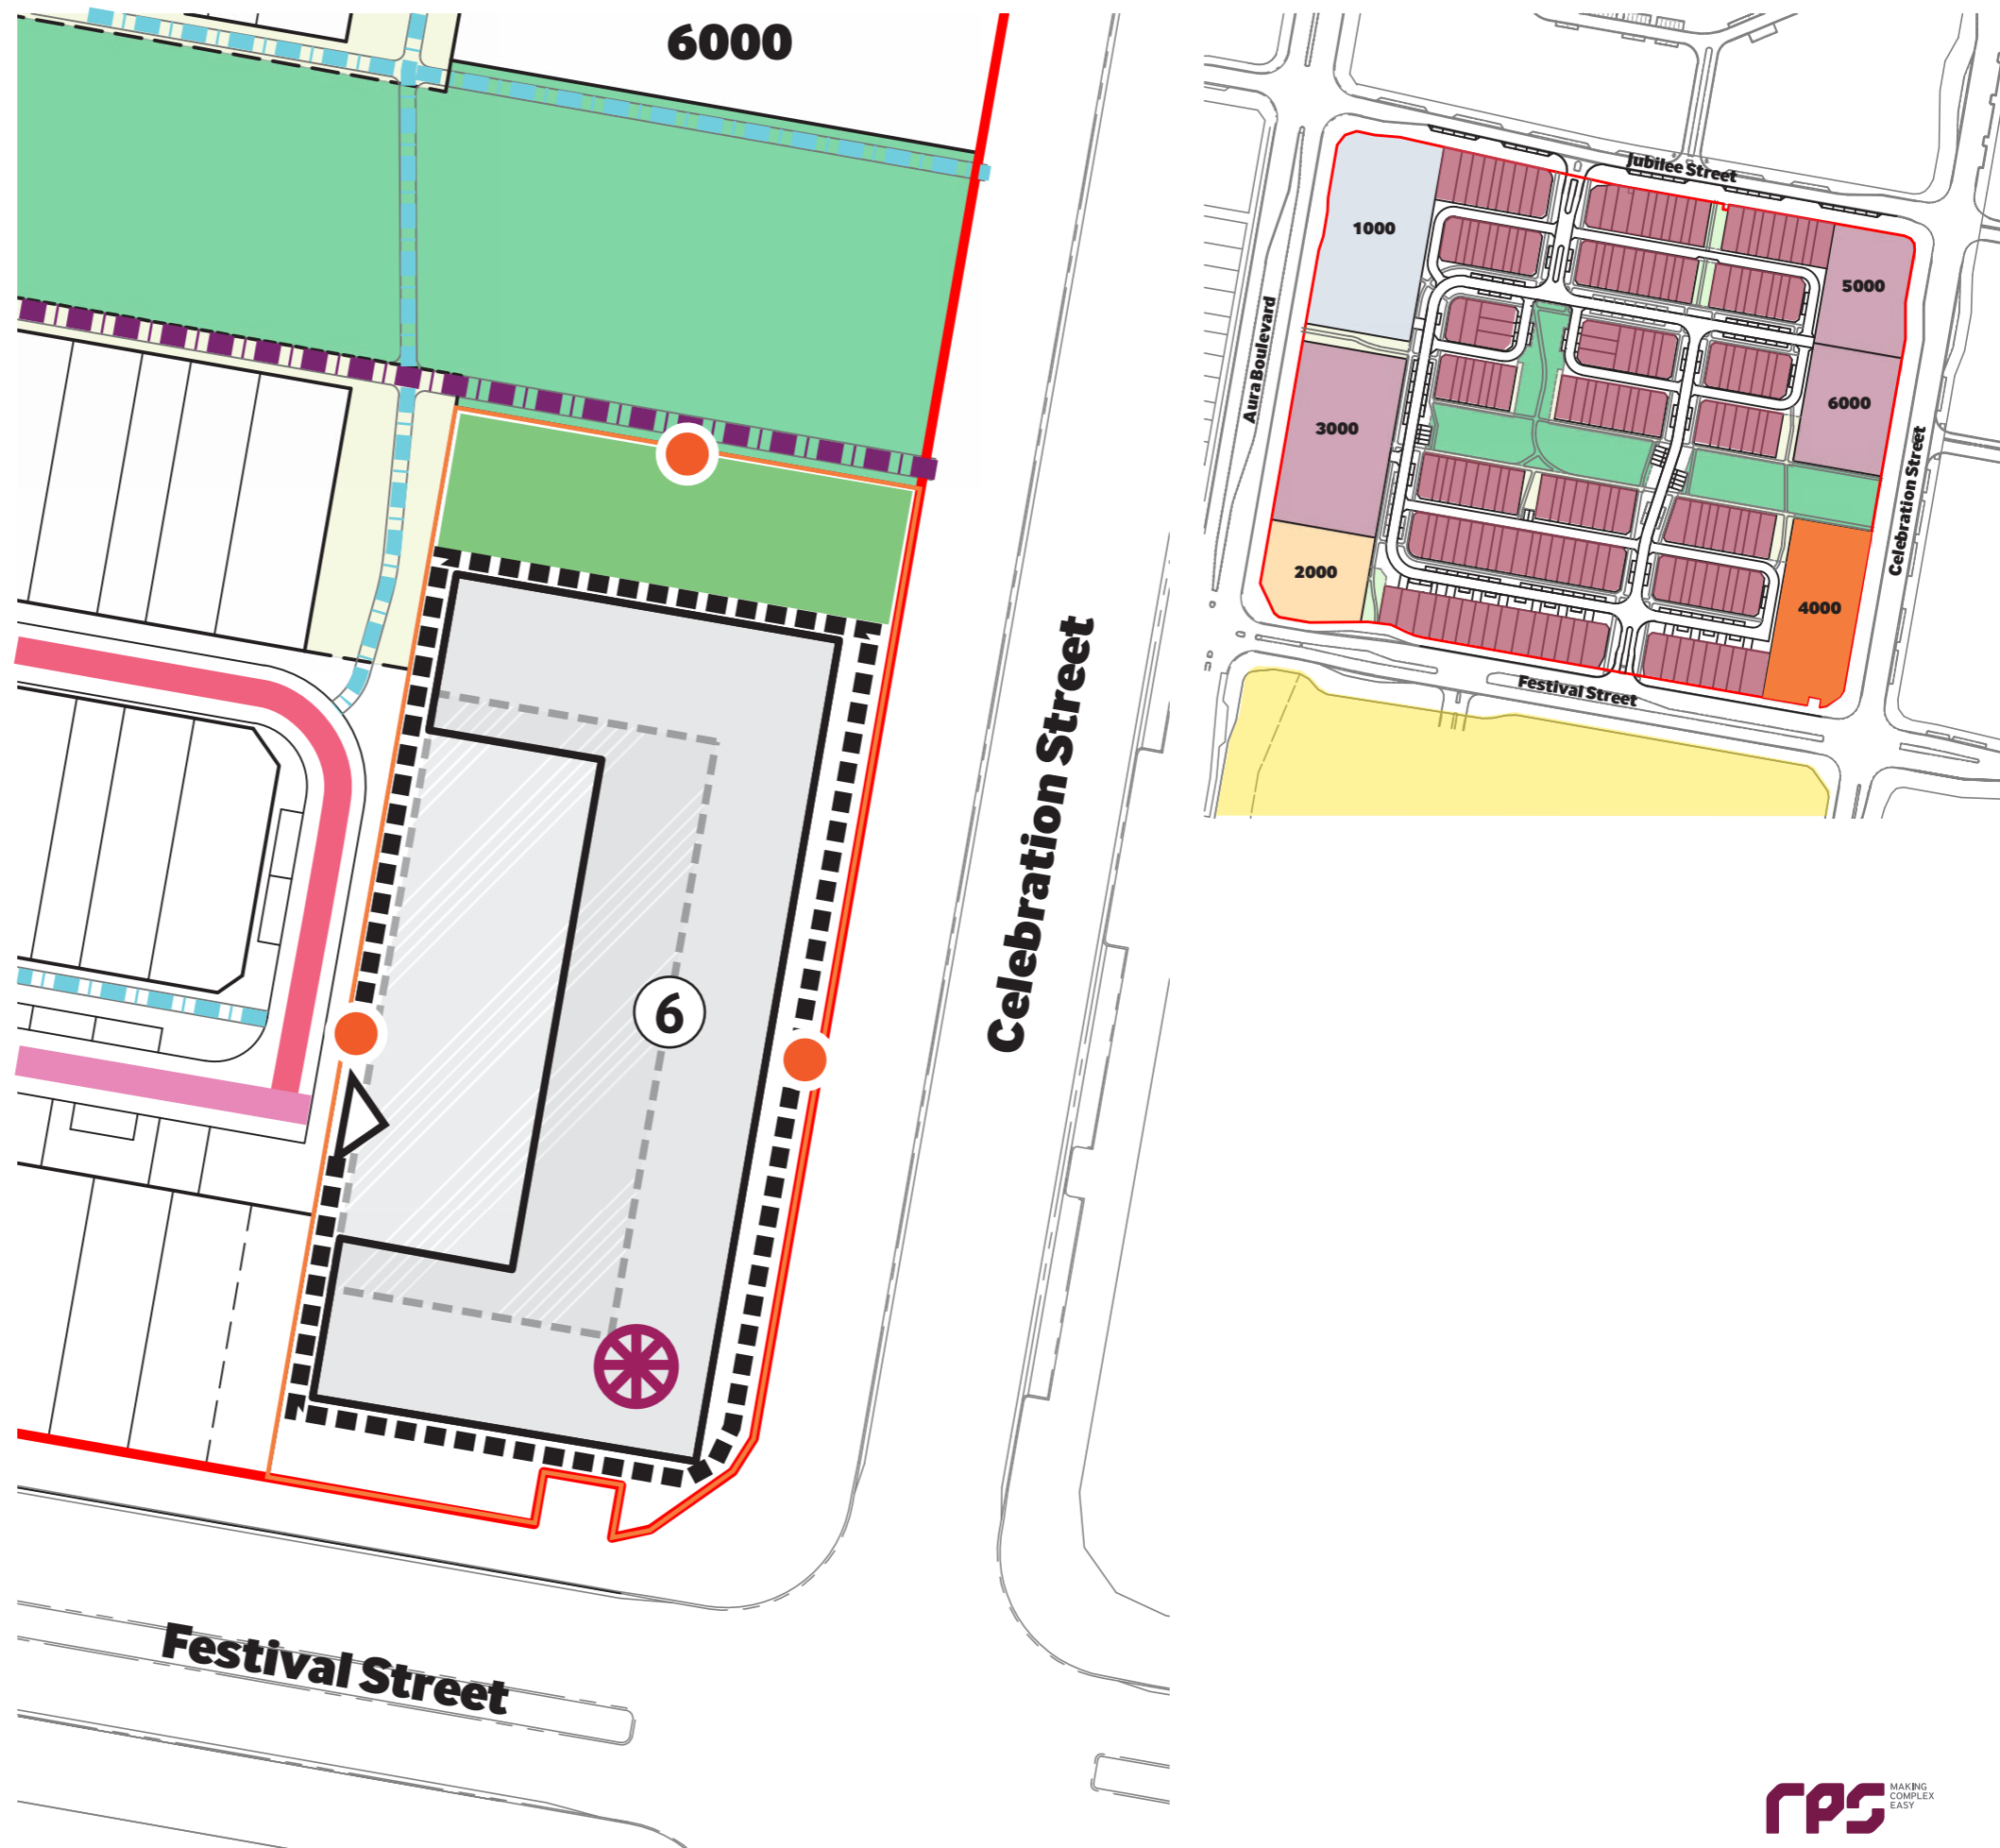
SUB-PRECINCT 9.1B - PLAN OF DEVELOPMENT
